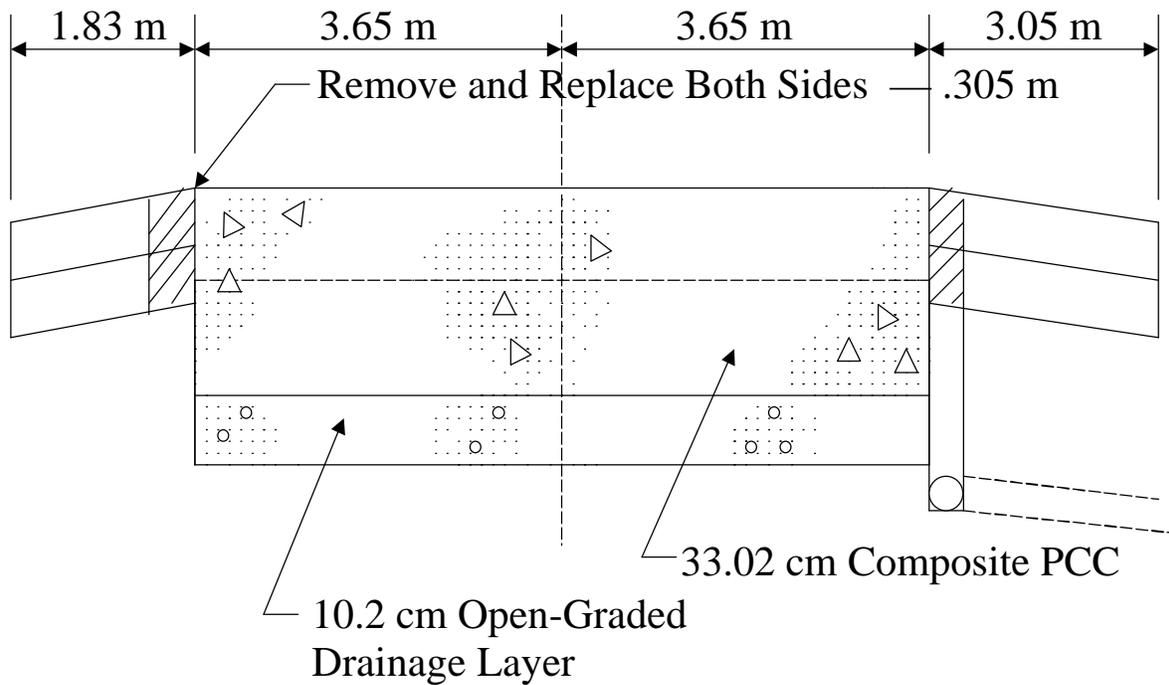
Unbonded concrete resurfacing alternative for example problem 1.
